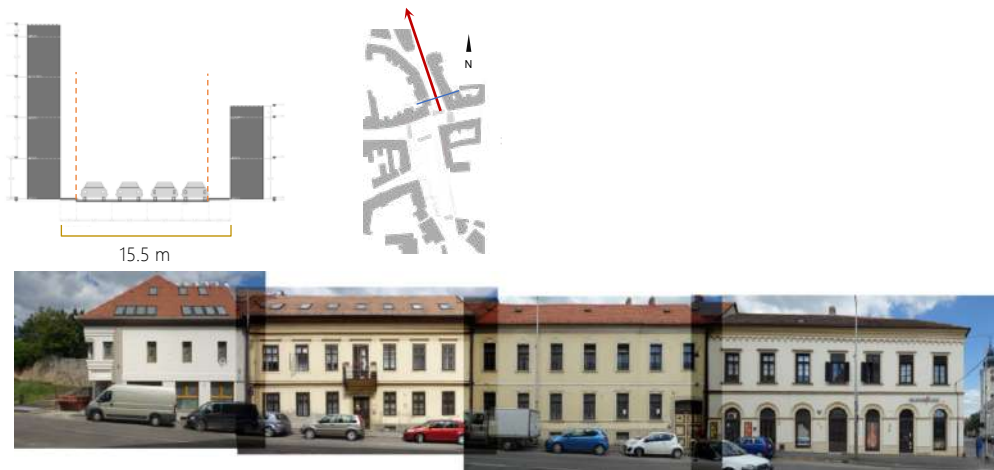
Rákóczi Street sample section and street elevations, Illustrated by author
